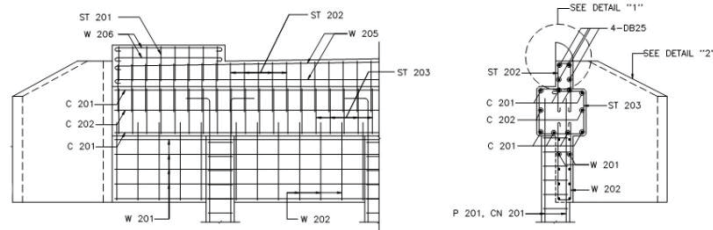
CAP BEAM AND WINGWALL OF ABUTMENT
